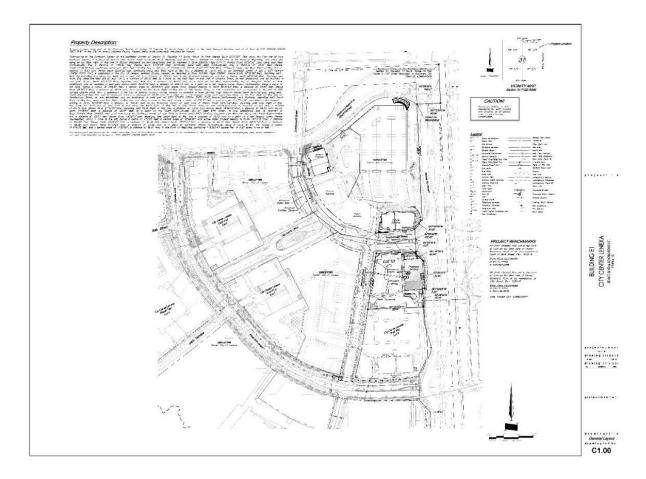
A traditional site plan sheet that was submitted as part of an official document of record for a plan submittal.
